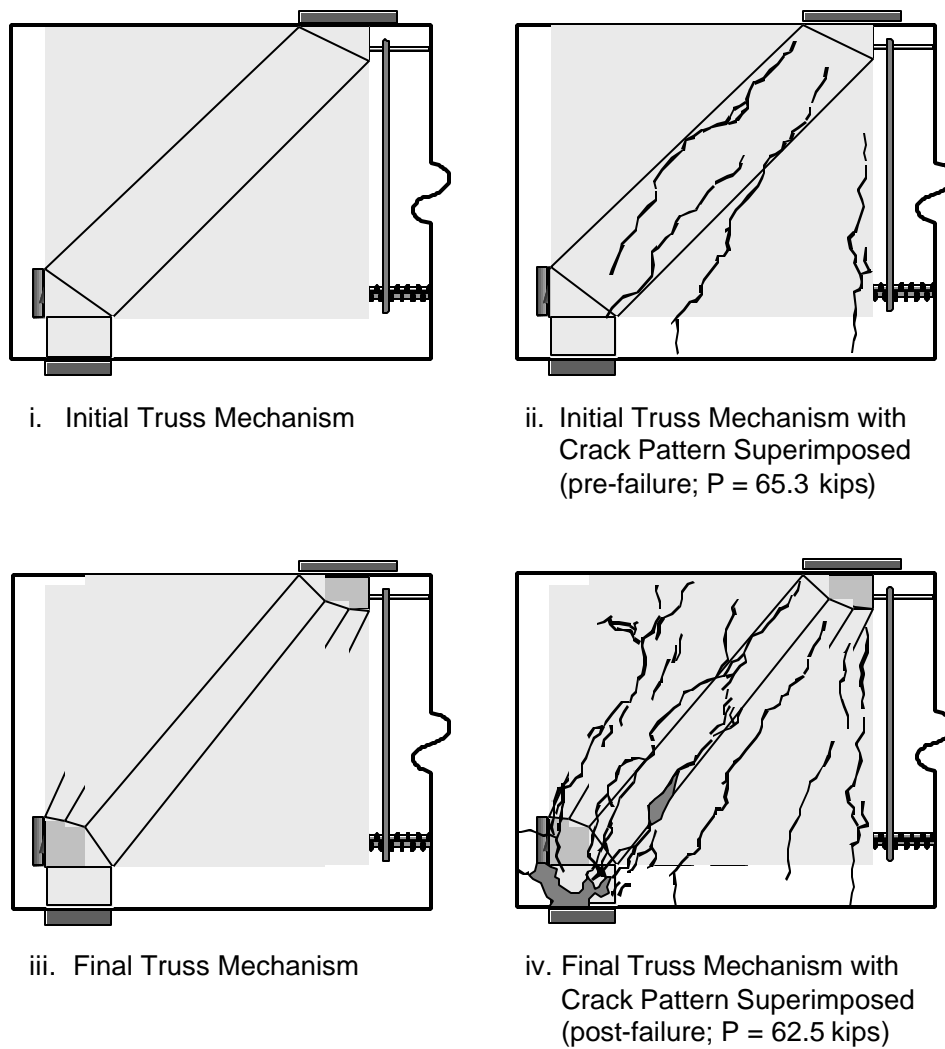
Crack patterns overlaid onto probable truss mechanisms for the heavily confined, headed bar specimen (CCT-08-45-04.70(V)-1-C0.012)
